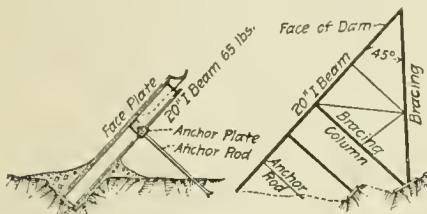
CROSS-SECTION OF STEEL DAM,
